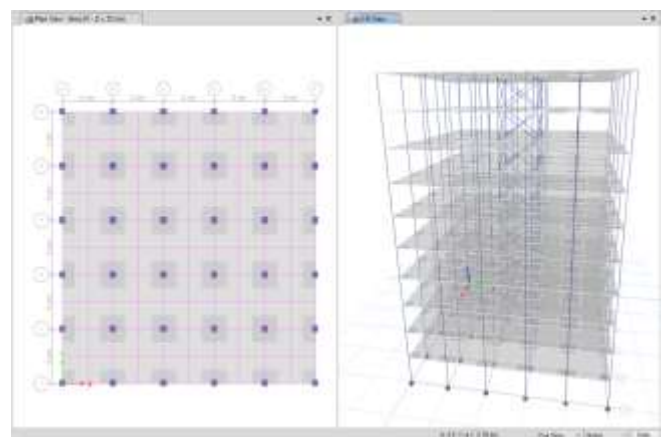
MODEL-C1 REGULAR FLAT SLAB BUILDING WITH BRACINGS
